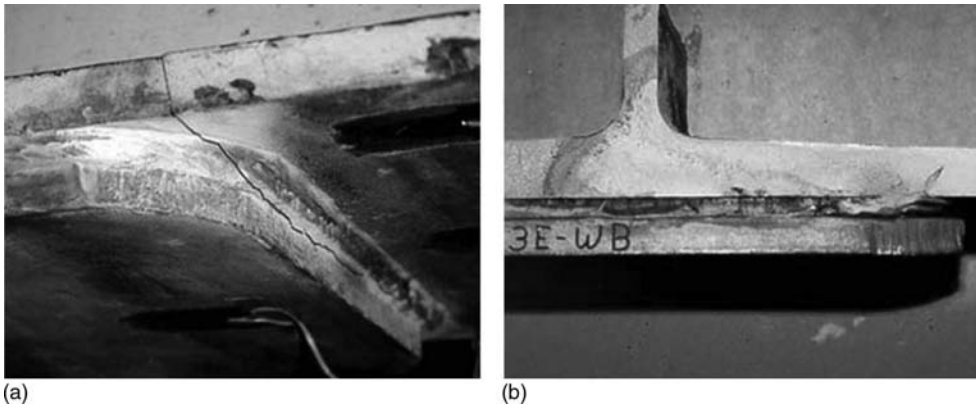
Through throat cracking at peened cover-plate end weld in Yellow Mill Pond Bridge: (a) fatigue crack progression; (b) exposed fracture surface.
